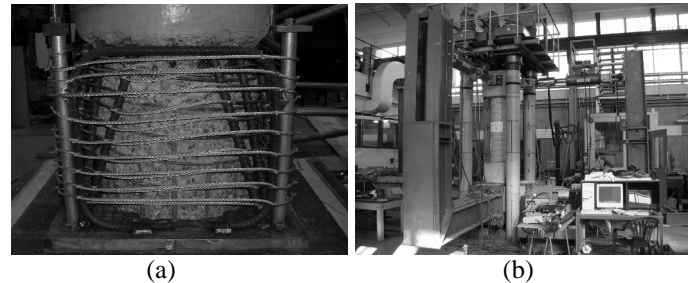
Photos prior to testing: (a) the reinforced shoe block; (b) the testing apparatus.
